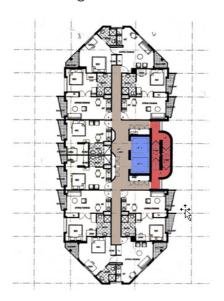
Case 2 Typical Floor Plan Source: Diagram by E. Vasilyeva QUT
